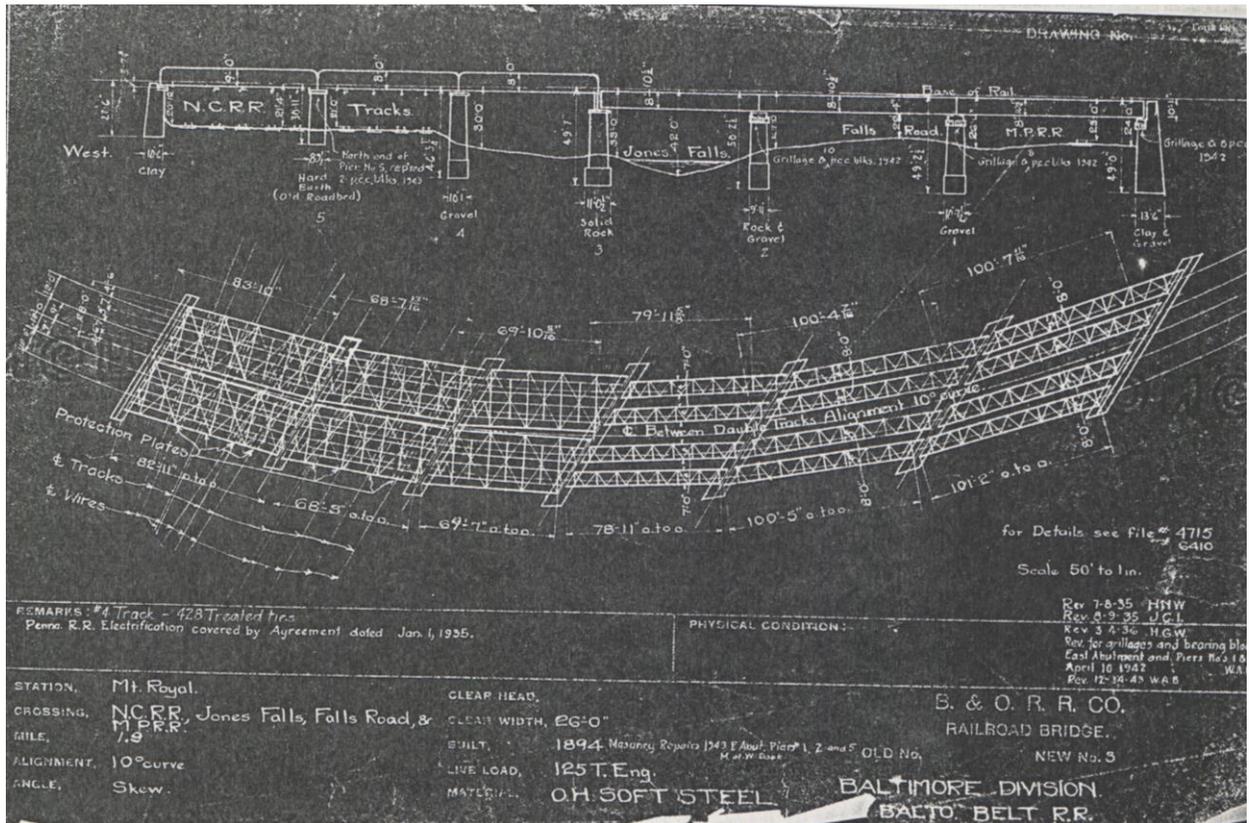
Section and plan of the North Avenue Bridge, n.d. (annotated in 1935, 1936, 1942, and 1943).
